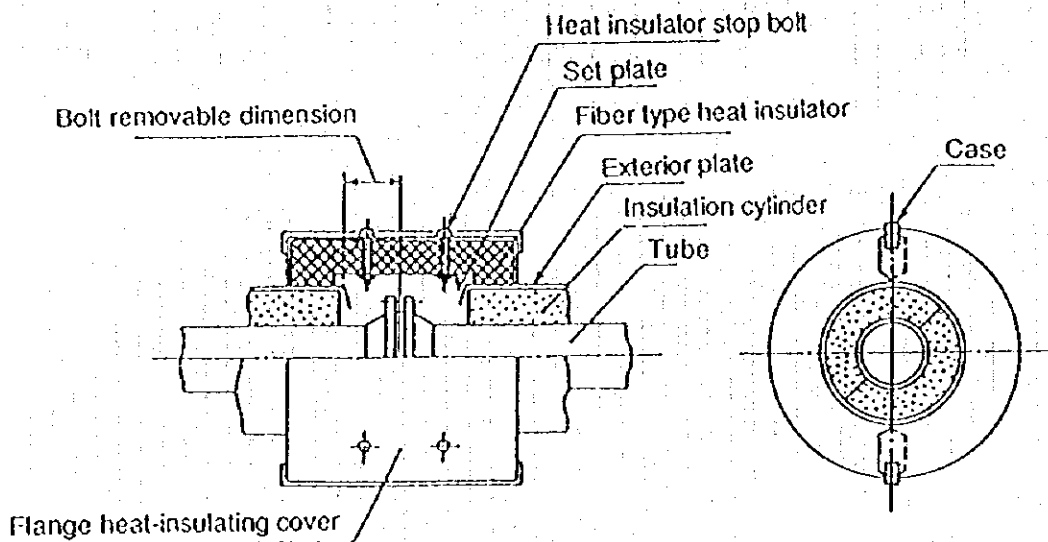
Standard Drawings of Thermal Insulation for Valves and Flanges
